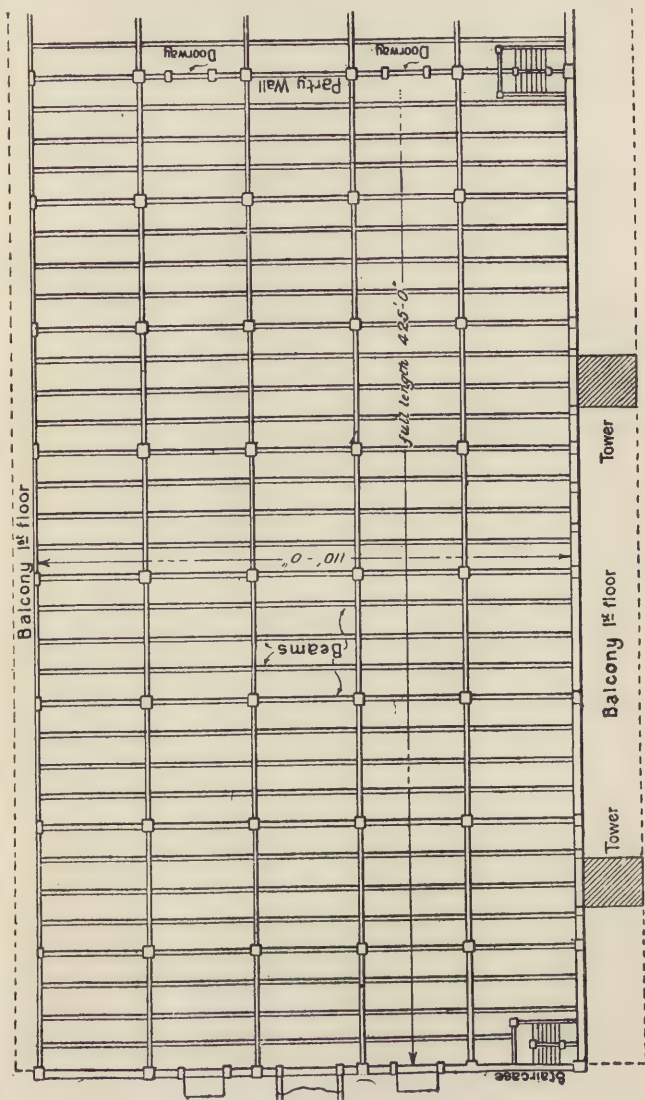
Half Plan of a 425-ft. long Transit Shed.
